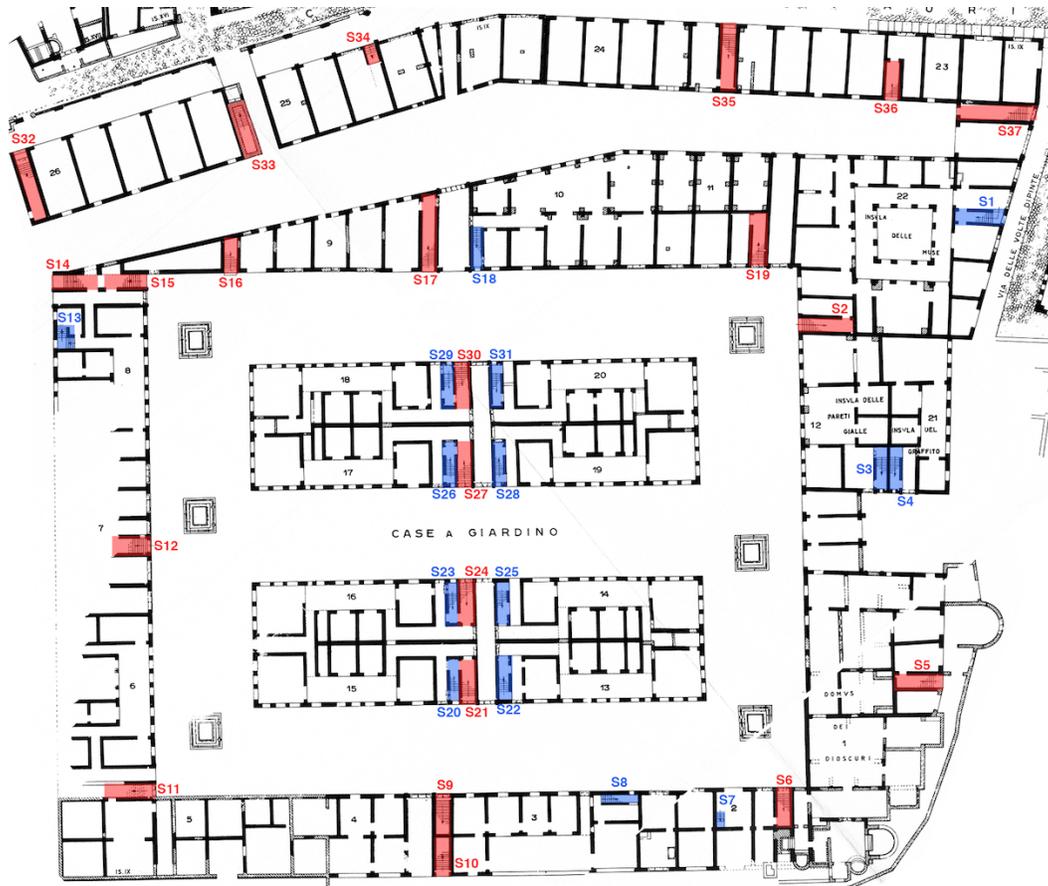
Plan of the Garden Houses complex with stairs numbered and highlighted. Traditionally internal stairs are blue, external are red. After *Scavi di Ostia* vol. 1.
